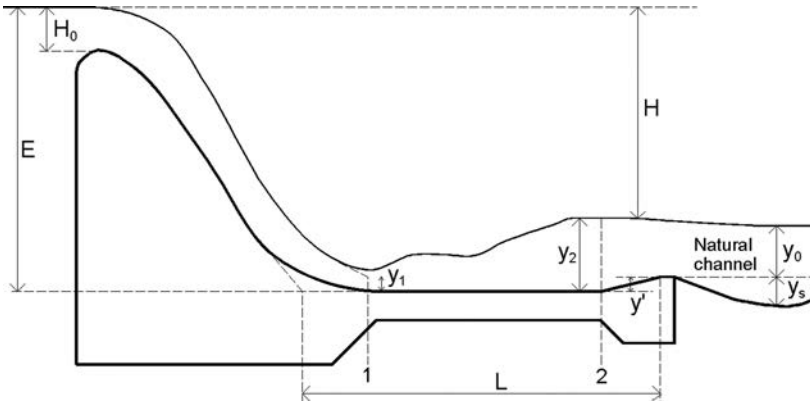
Definition sketch for hydraulic jump stilling basin.
